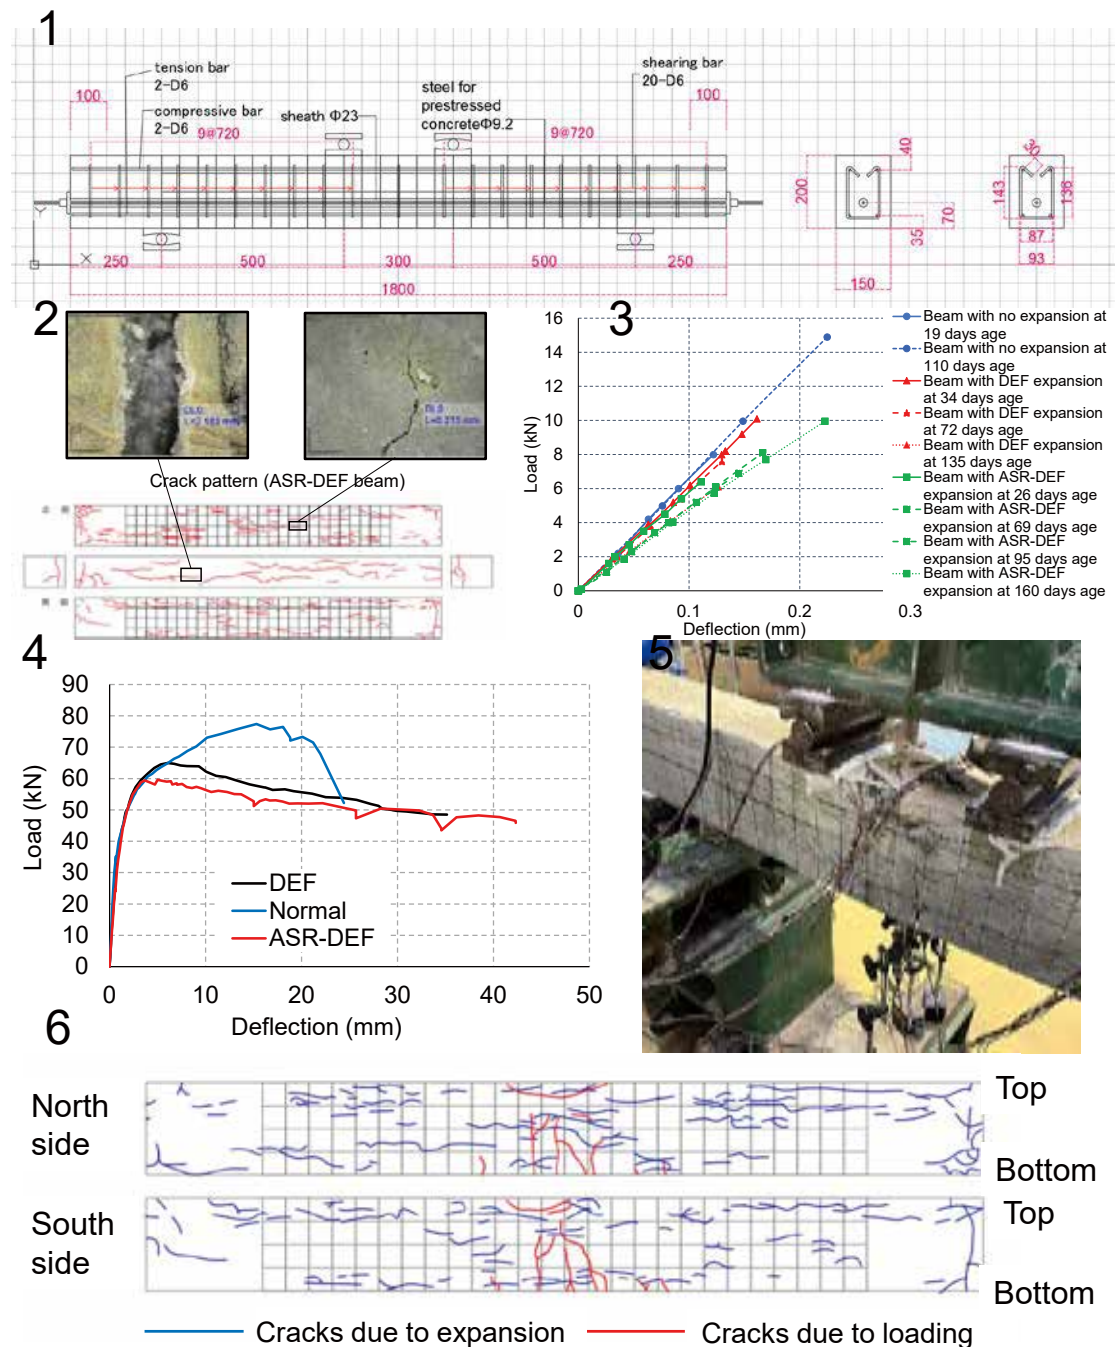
Overview of prestressed concrete beam (unit: mm); Fig. 2 Cracking in beam with ASR-DEF expansion; Fig. 3 Load and deflection relationship variation of prestressed concrete beam under low loading with internal swelling reaction progress; Fig. 4 Load and deflection relationships of prestressed concrete beams to failure; Fig. 5 Photo at flexural tensile failure of prestressed concrete beam with DEF expansion; Fig. 6 Cracking pattern due to ASR-DEF expansion and loading
